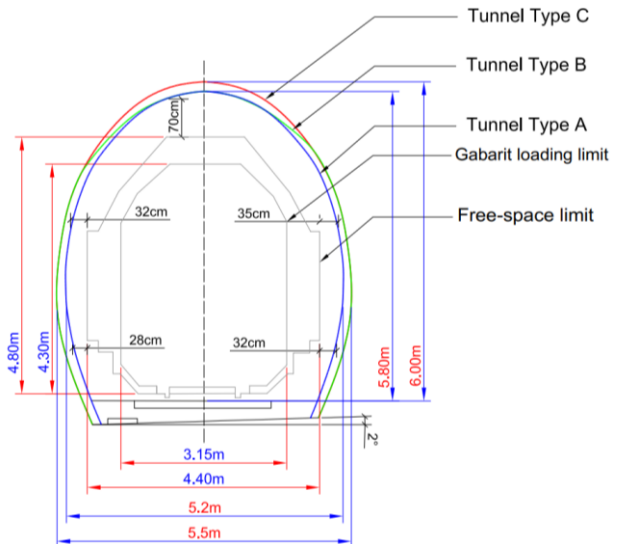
Types of old tunnels in trans-Iranian railway and loading gauge
